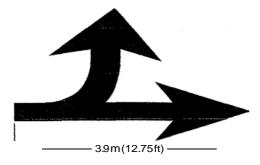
Examples of Standard Arrows for Pavement Markings
